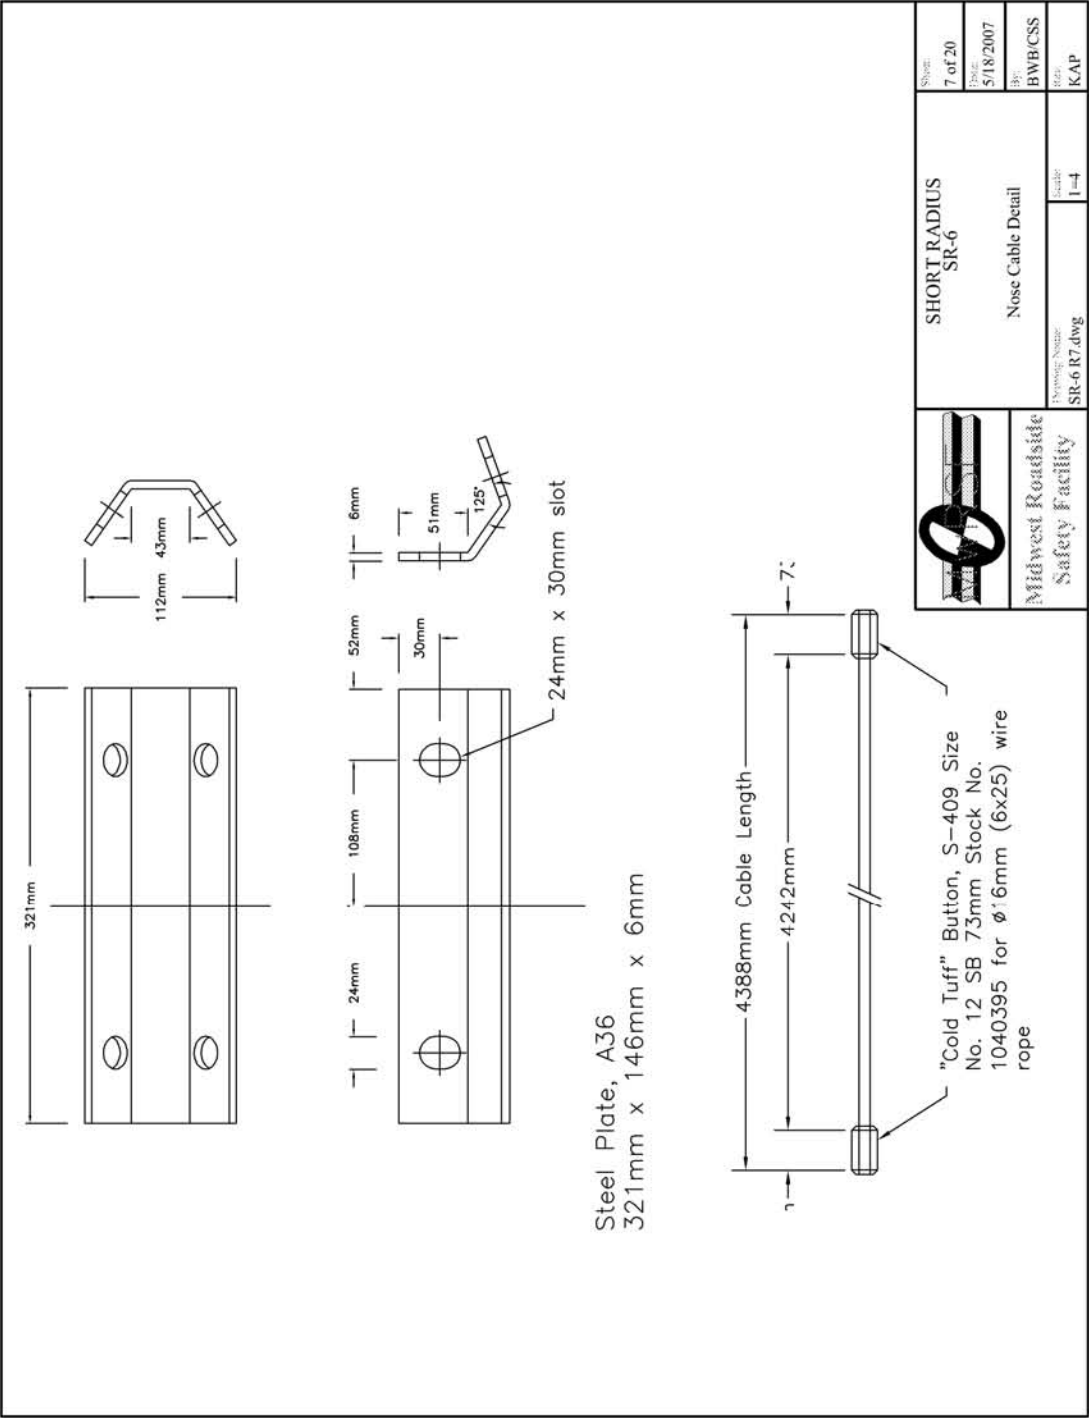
Nose Cable Anchor Plate Details, Test SR-6
